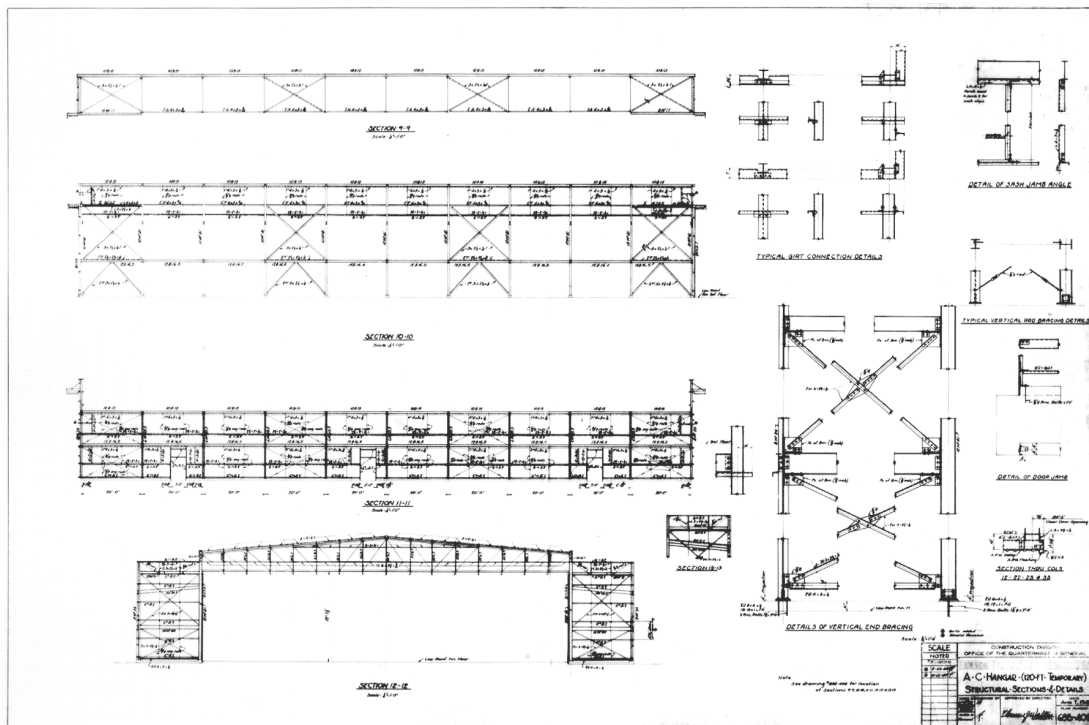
Plan No. 695-409, 120-Foot Temporary Hangar, ca. 1940. (Source: 105mm film archives at U.S. Army Corps of Engineers History Office, Fort Belvoir, VA.)
